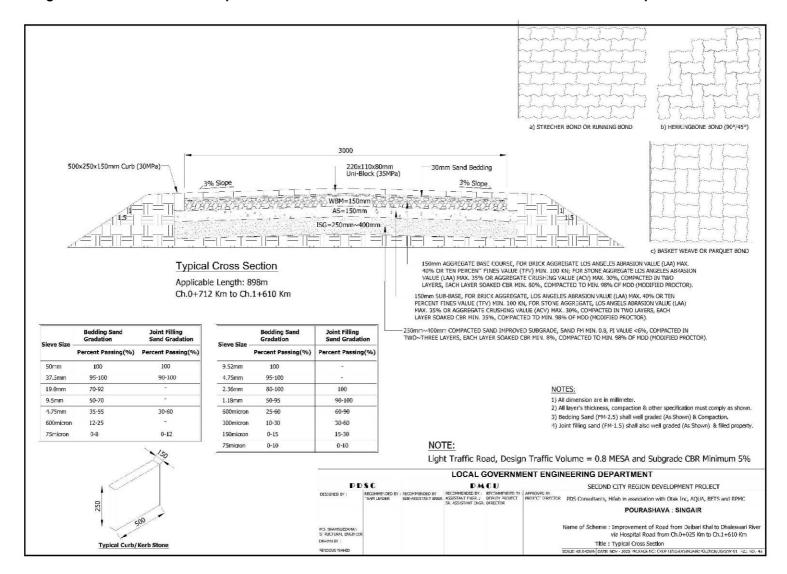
Cross section of Improvement of road from Daibari Khal to Dhaleshwari River via Hospital Road
